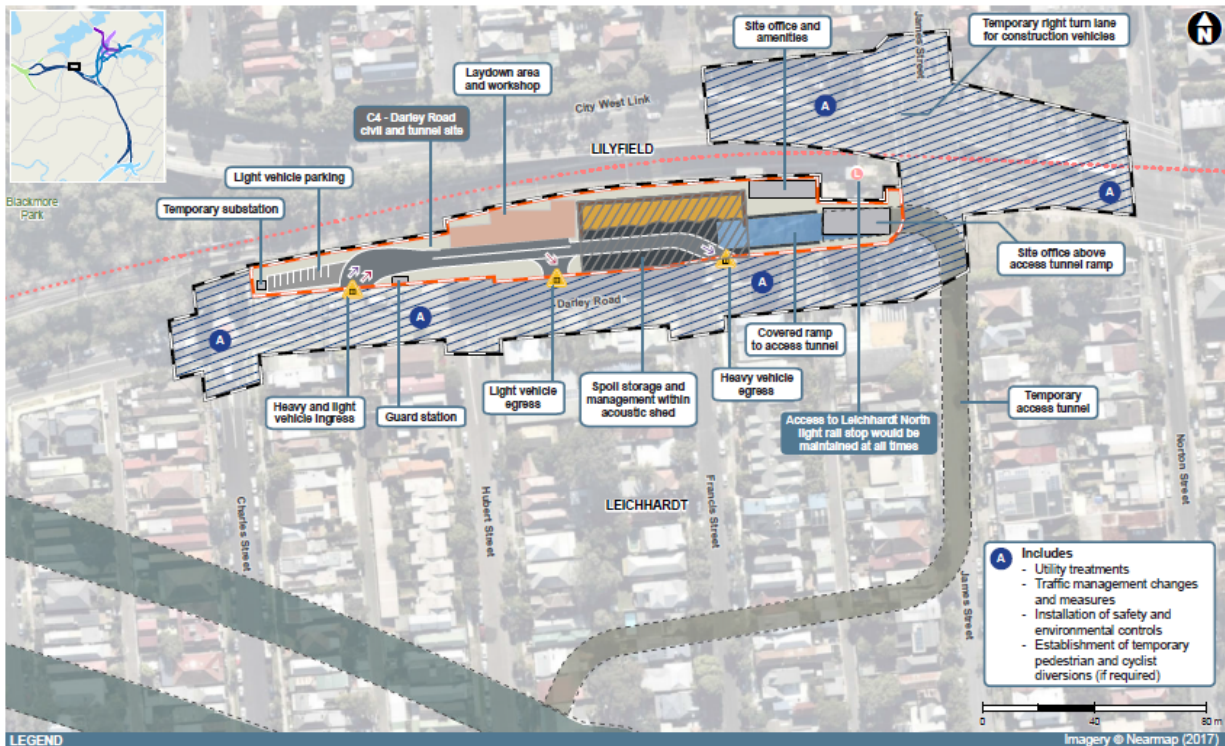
Indicative Darley Road civil and tunnel site (C4) layout
